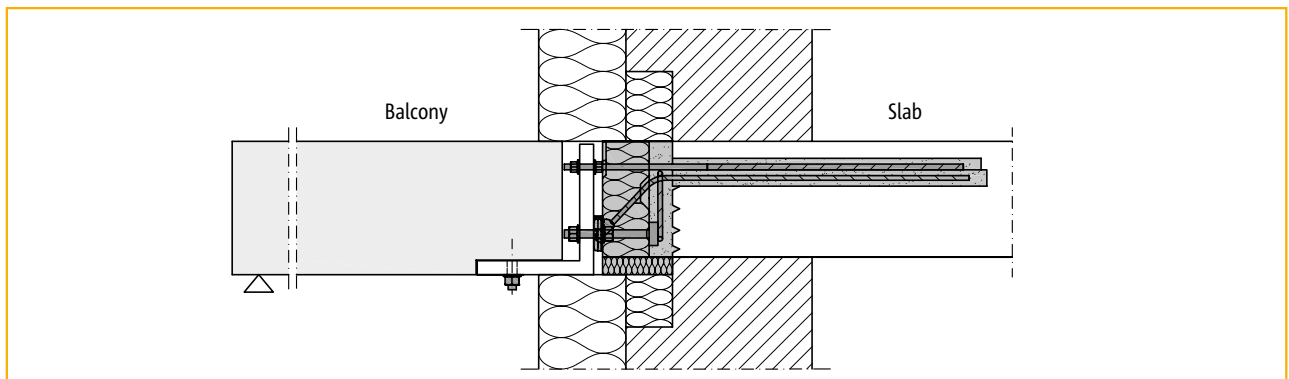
Connection of a prefabricated balcony to an existing floor using type RKS10, support construction
